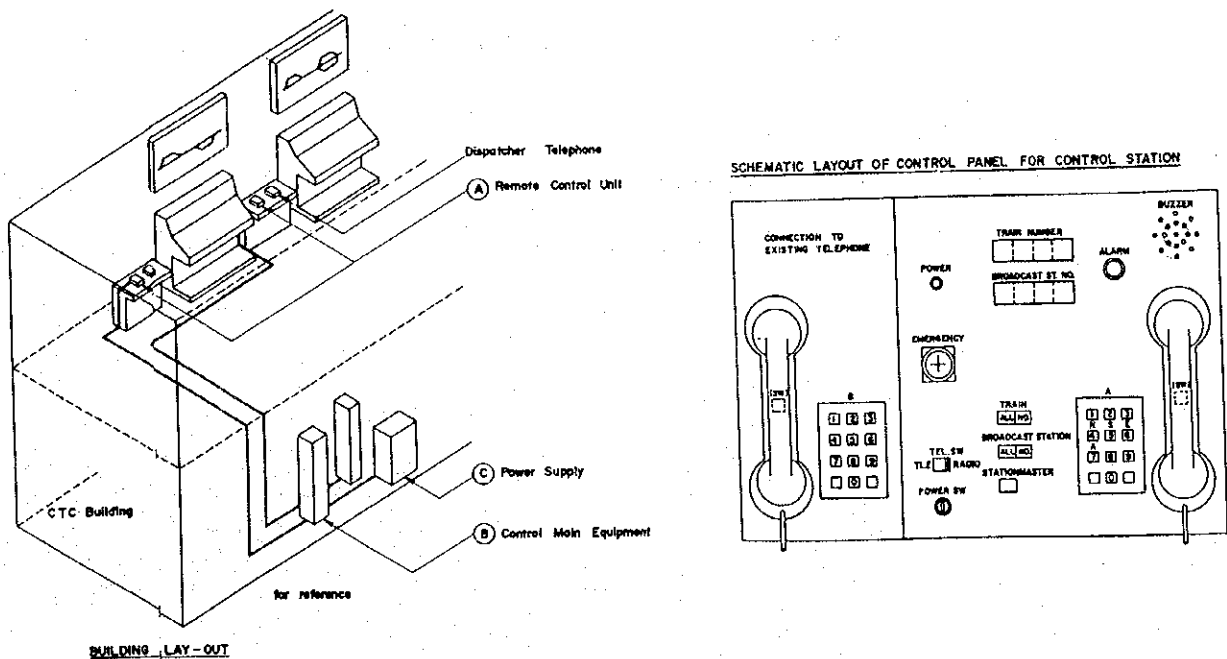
Building Layout and Control Panel for a Control Station
